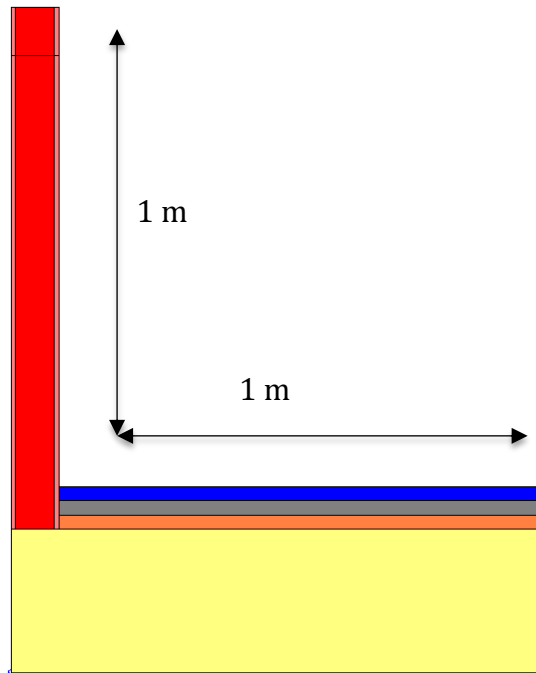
SECTION FLOOR-WALL CONNECTION THERMAL BRIDGE
